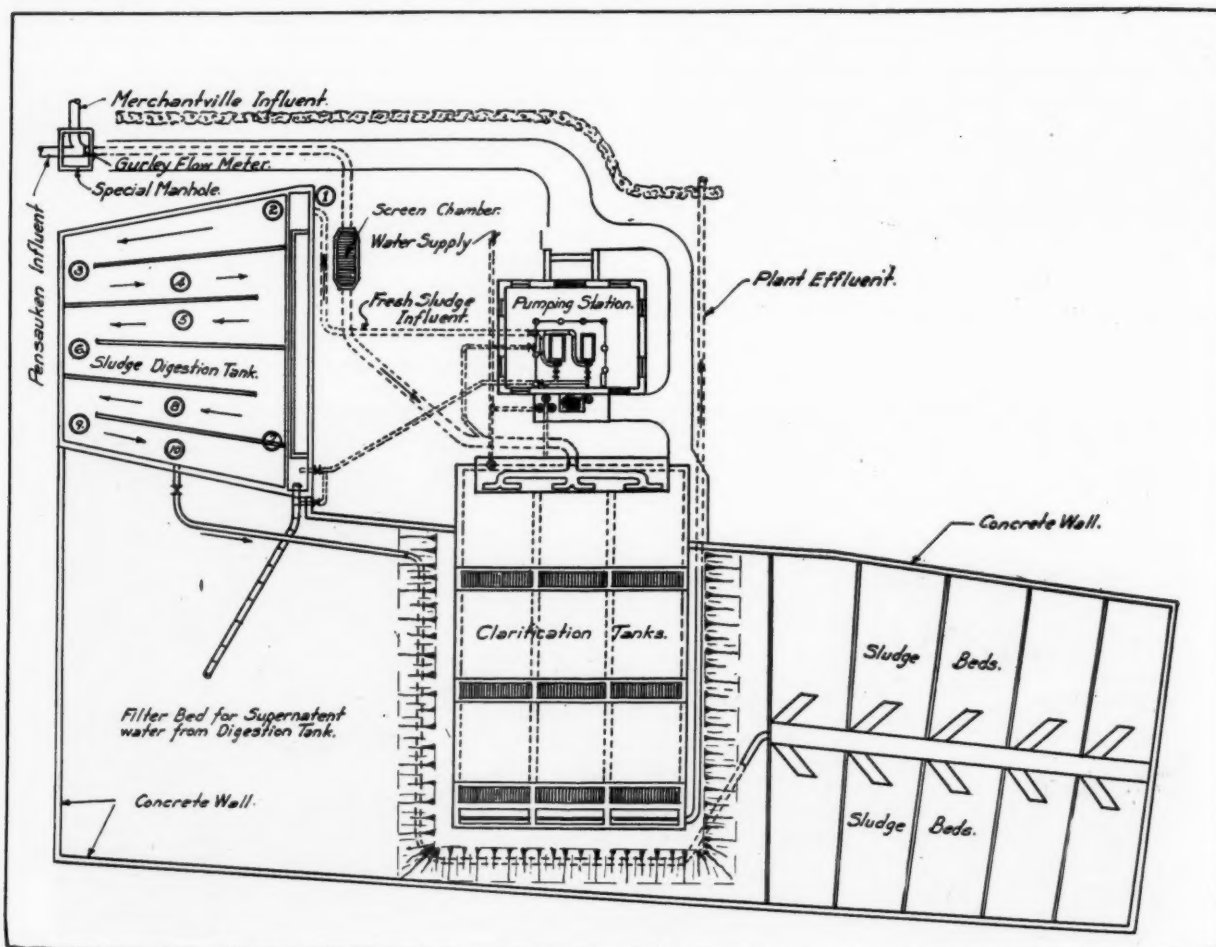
GENERAL PLAN OF MERCHANTVILLE-PENSAUKEN SEWAGE TREATMENT PLANT
